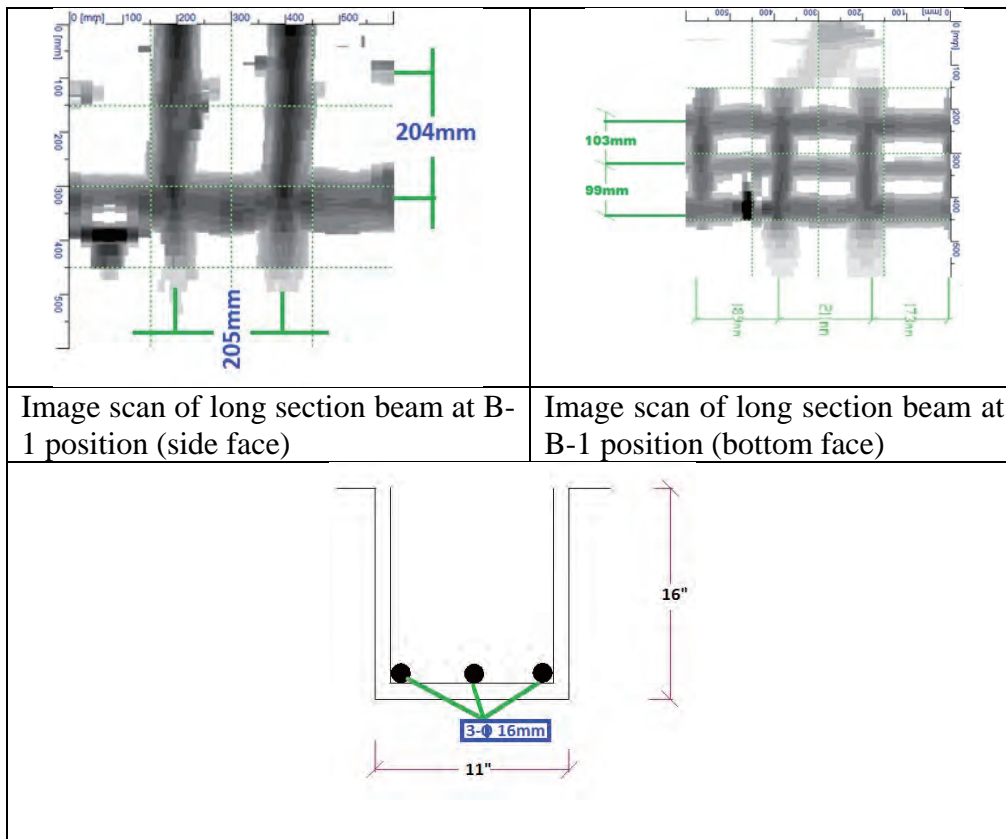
Cross section (in built) of beam at B-1 position (marked in figure - 1) at ground floor
